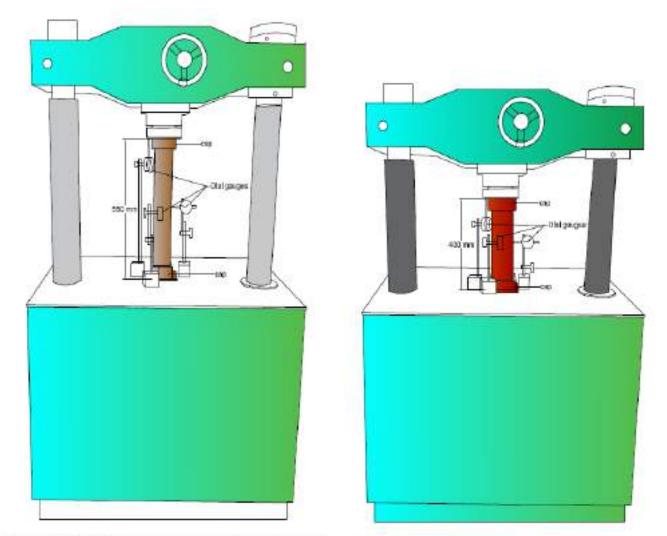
Test arrangement of long column Figure (3-36) Test arrangement short column
